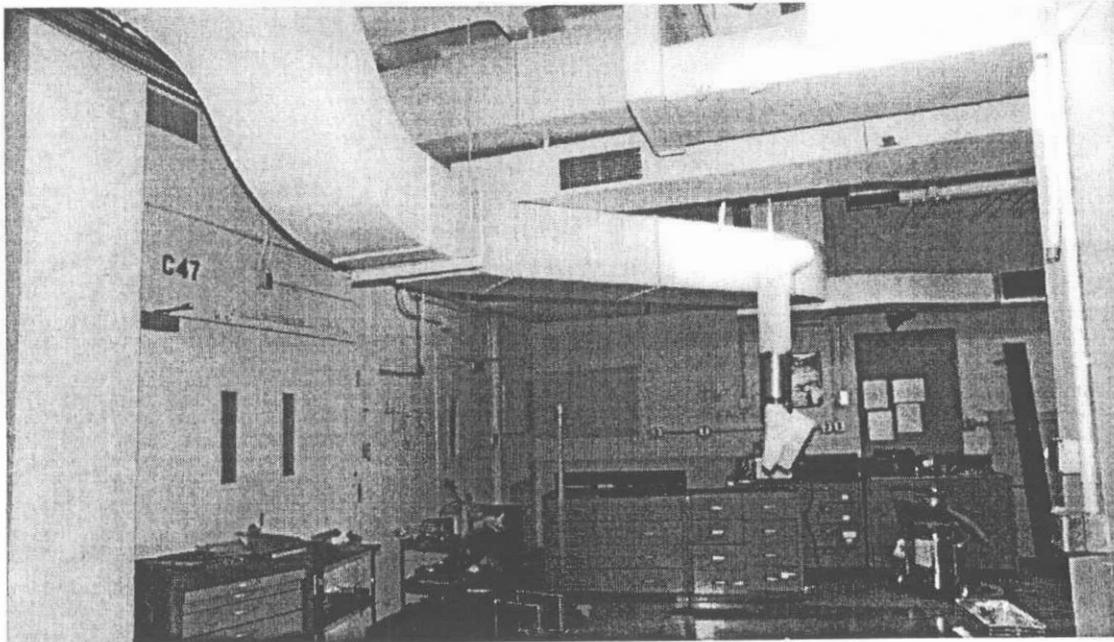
Typical furniture, equipment, piping, and ducting in the former Helium Laboratory.
